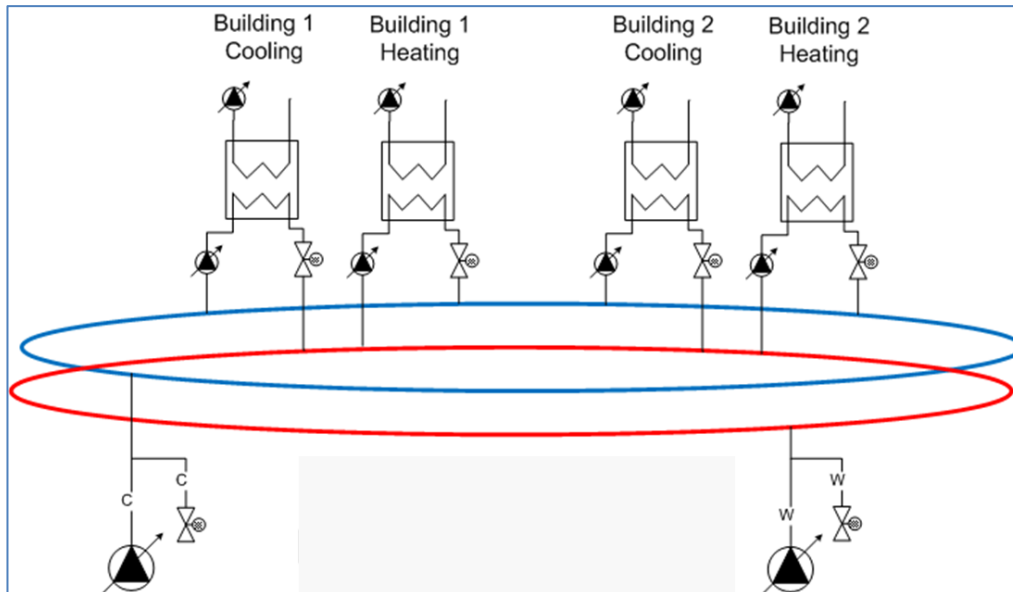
Two-pipe groundwater distribution, active building connections (IFTech)
